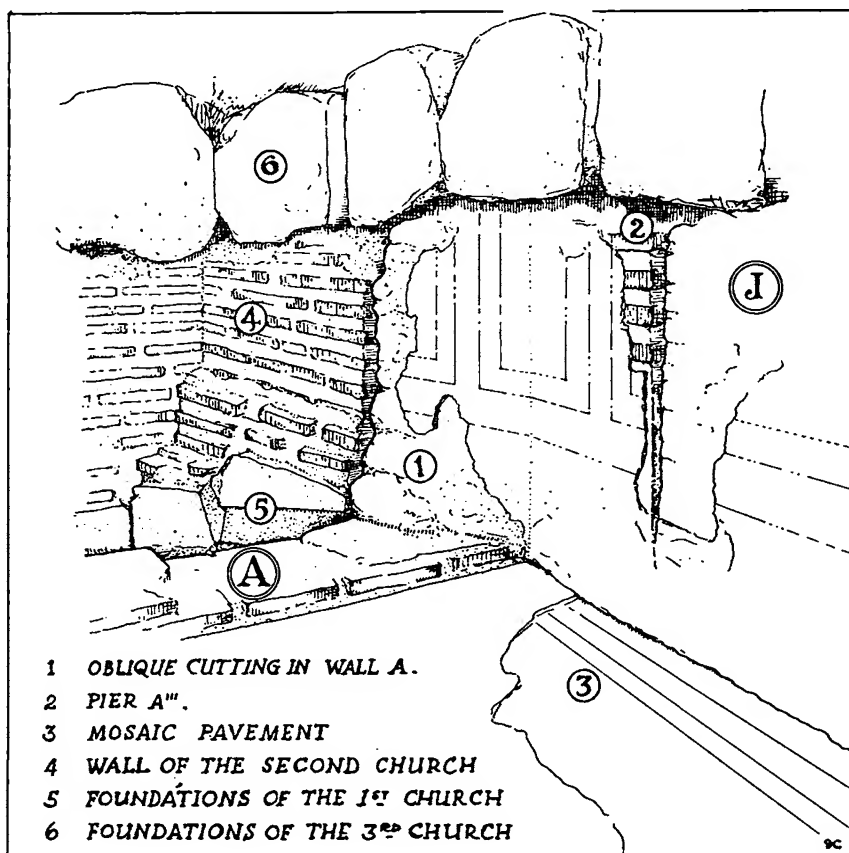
S. Marco. South-east corner of east aisle (Sketch: Corbett).
